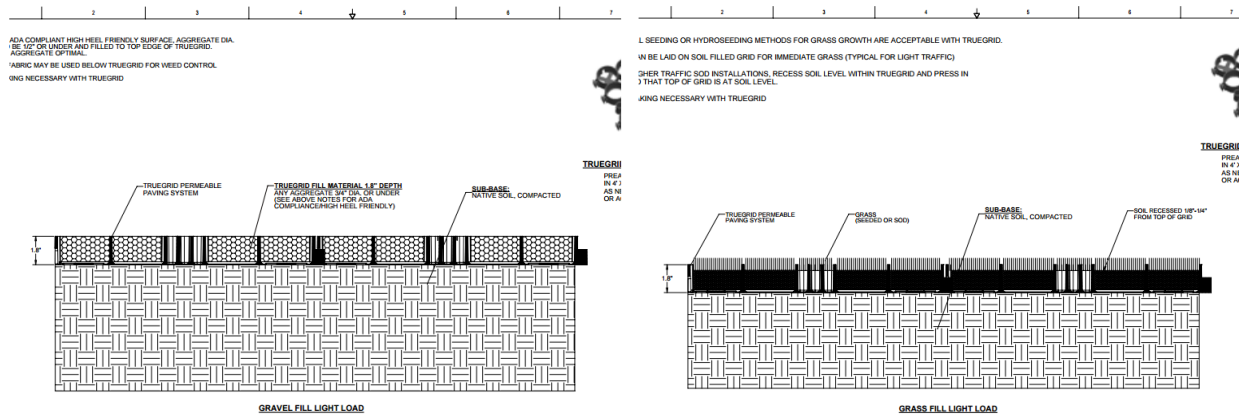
Light load parking lot examples for plastic grid pavers⁵⁴⁸
